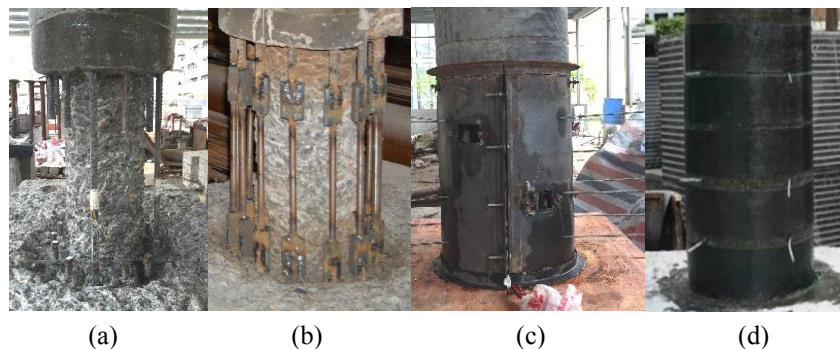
Repair and retrofitting solutions PR1 and PR2 for damaged RC piers: a) damaged concrete and rebar parts removal; b) longitudinal rebar substitution; c) concrete restoration by SCC (PR1) or UHPFRC concrete jacket (PR2); d) CFRP wrapping application (PR1 only).
